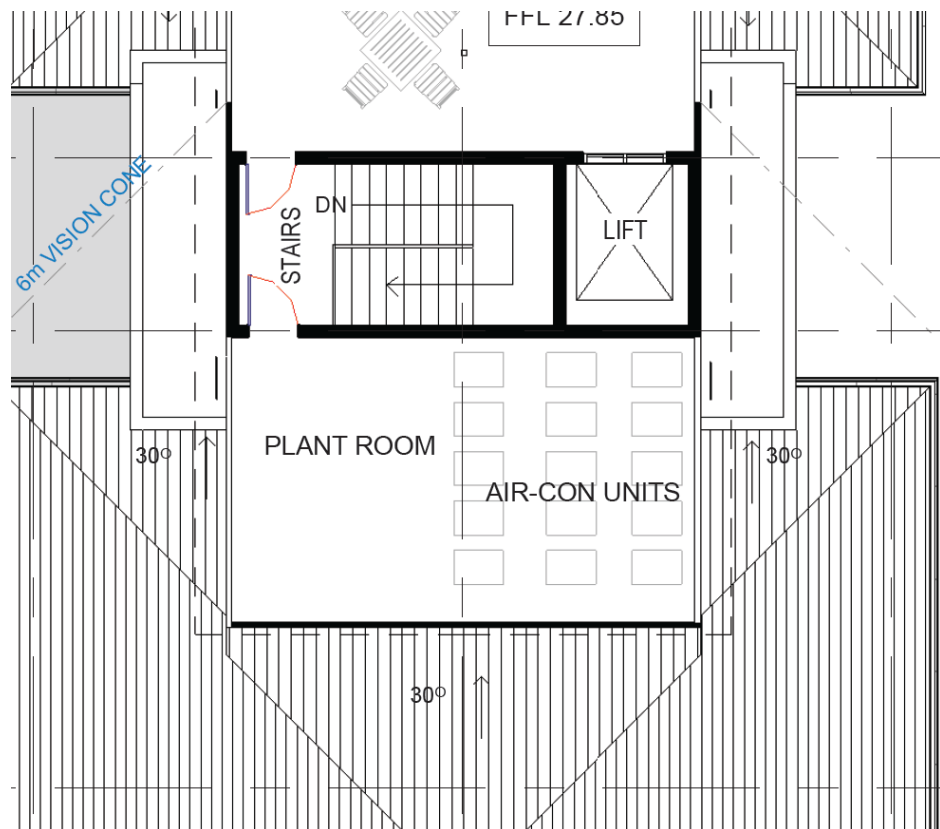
ROOFPLAN EXTRACT SHOWING PLANTROOM
